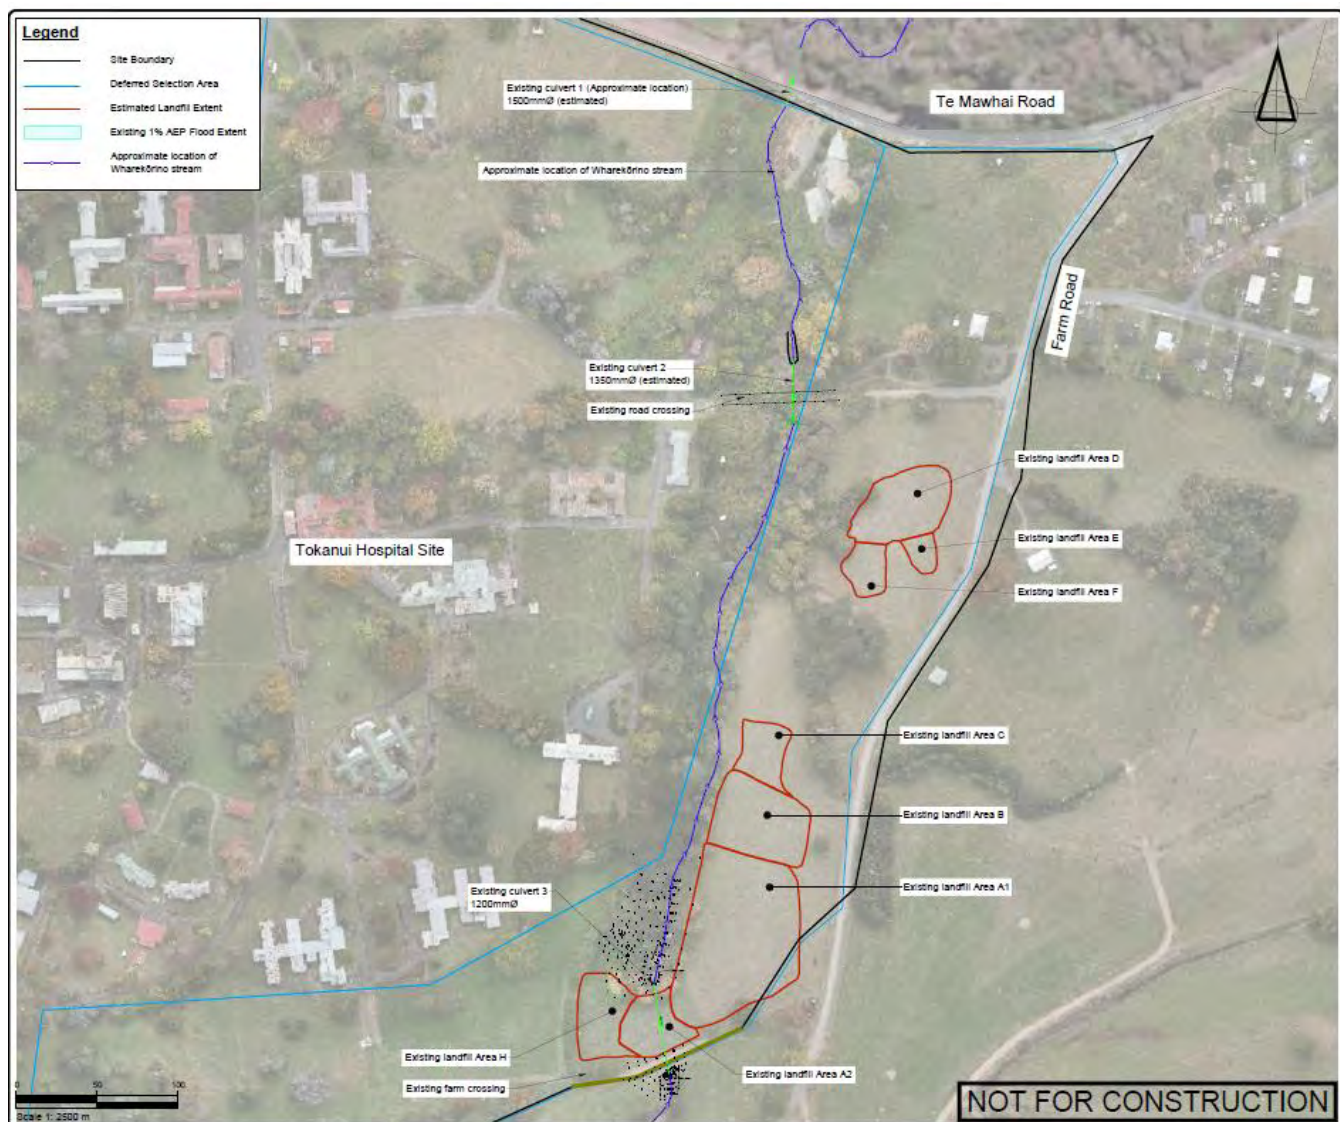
Existing Landfill Overview Plan, Rev A, 23 May 2025
